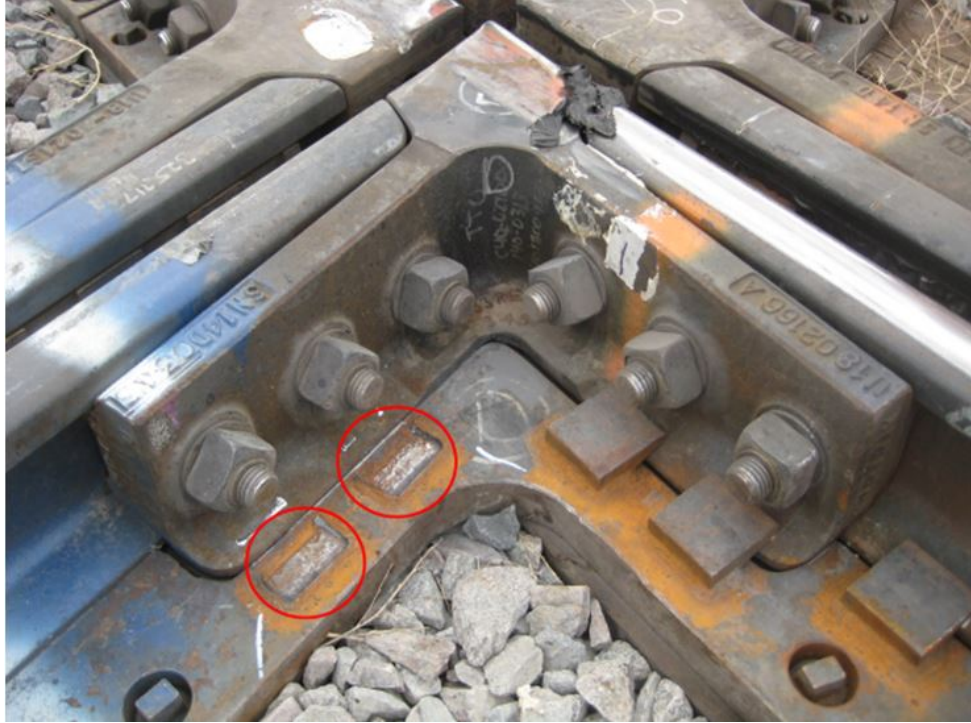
Welded tabs intended to keep the castings from jumping out of the milled platework required frequent replacement
